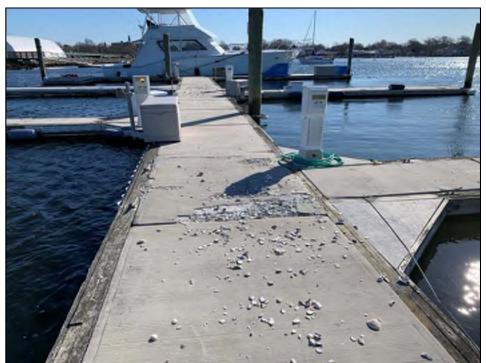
Cracking and deterioration of concrete deck with trip hazard.
